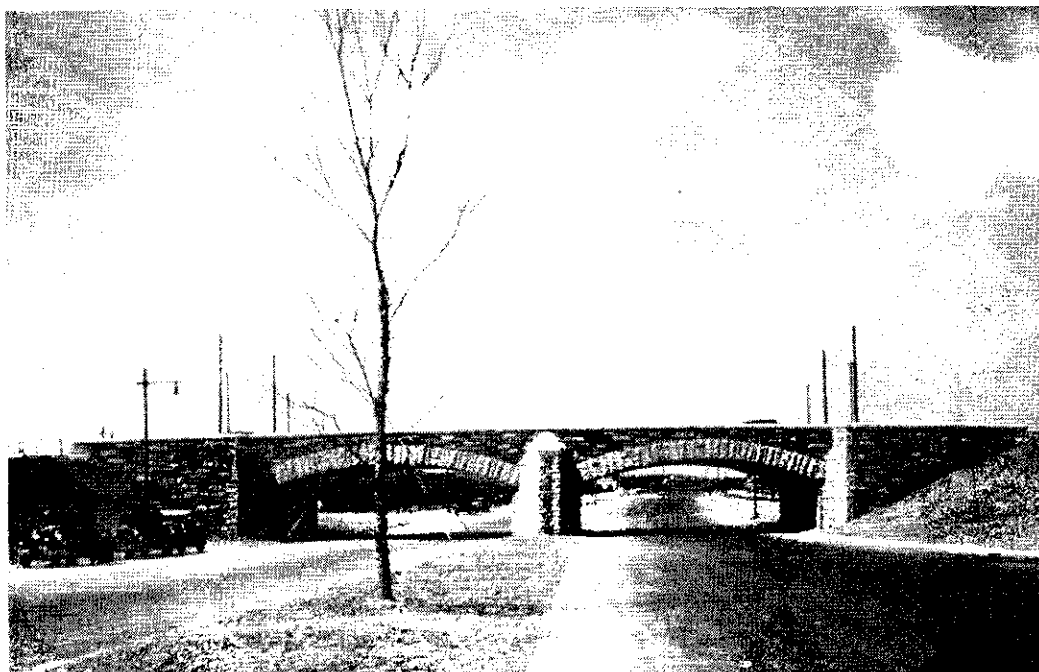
Cloverleaf grade separation south of U.S. Rte. 1 Highway Bridge (Mount Vernon Memorial Highway File #32-142, RG-30-N, NARA)
